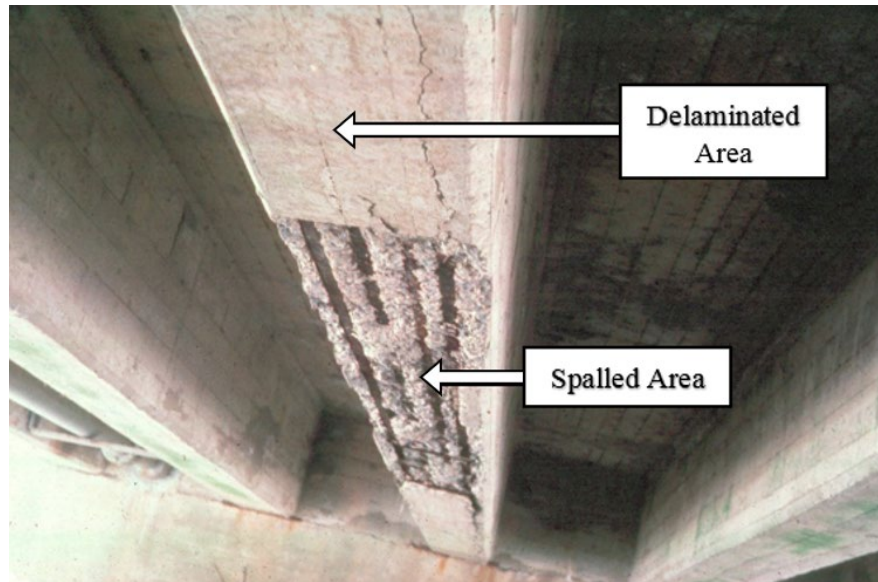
Delaminated and Spalled Tee Beam with Corroded Primary Reinforcement
